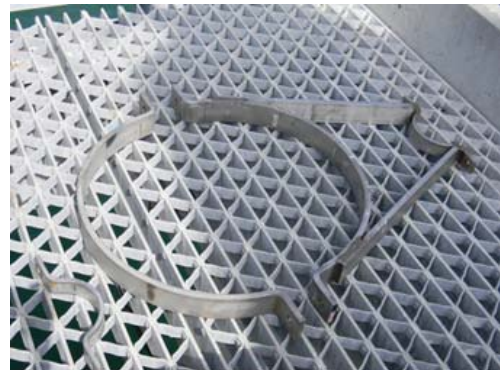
Stainless steel pier piling brackets (taken by the previous team).
